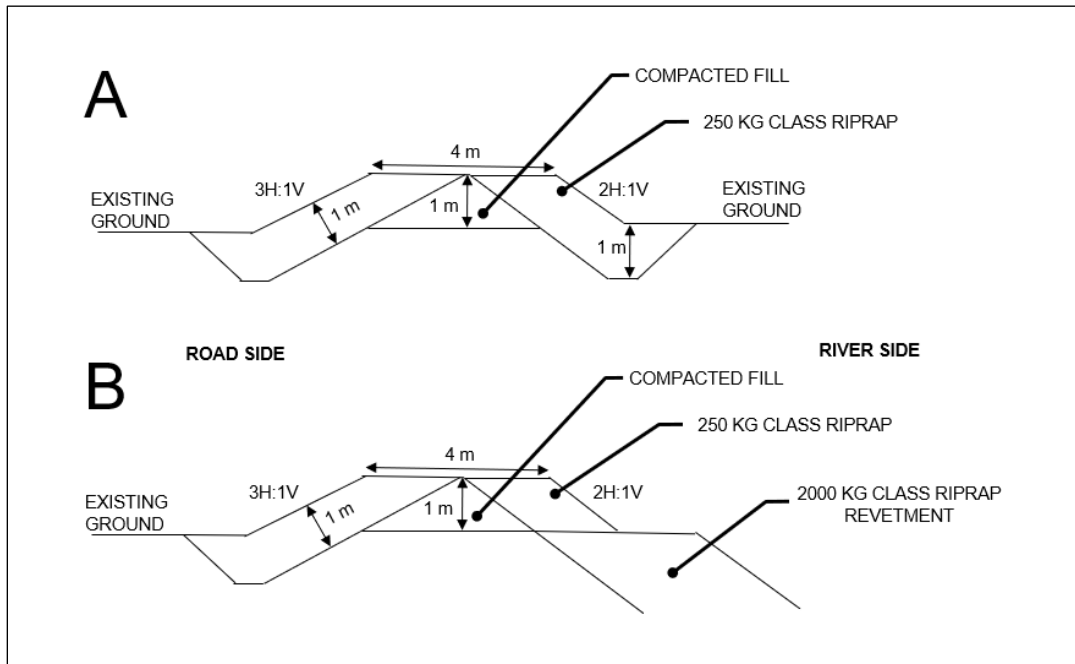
Typical cross sections for deflection berm setback from the Coquihalla River riprap revetment (A) and adjacent to riprap revetment (B), (not to scale).
